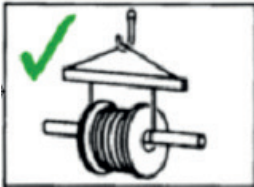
Drum trailer axle and spreader bar for safe damage free cable drum lifting.
